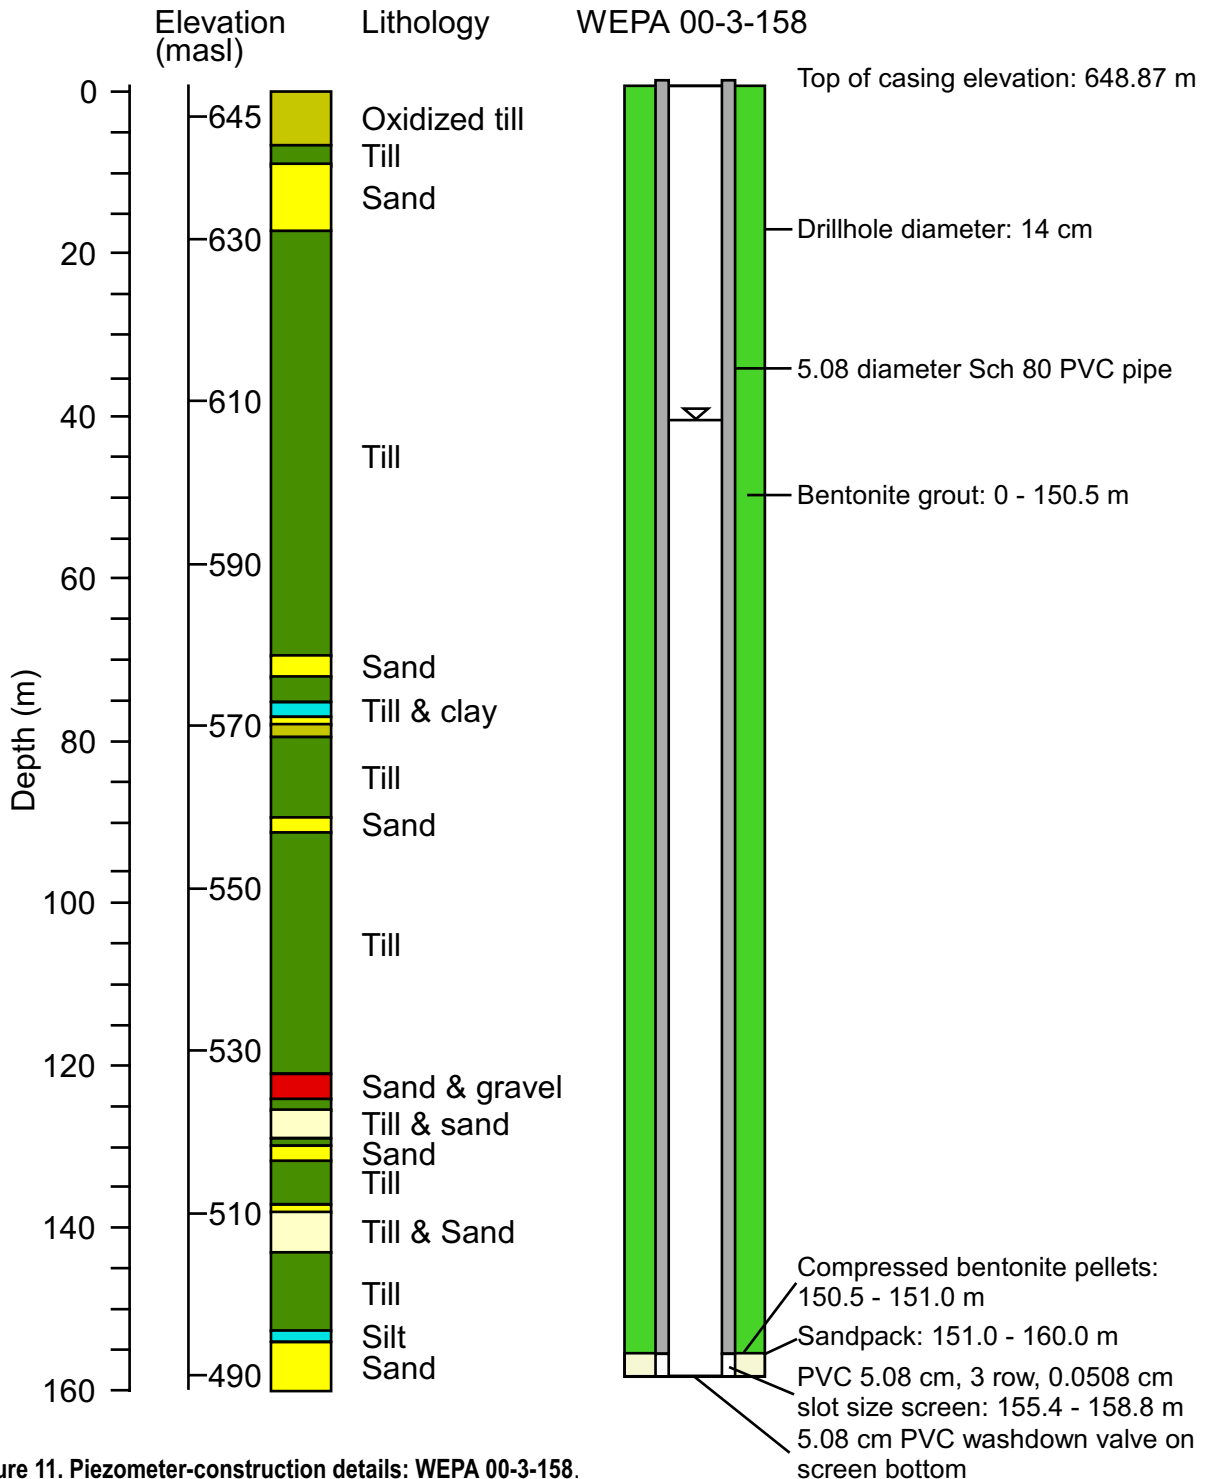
Piezometer-construction details: WEPA 00-3-158.
